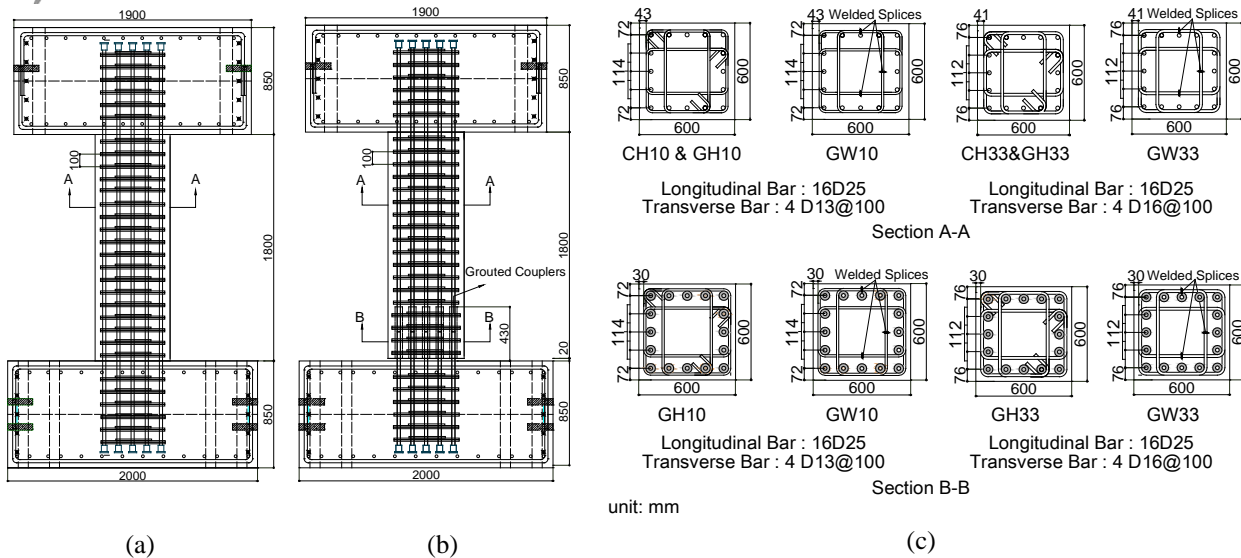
Cross Sectional Details (a) columns without grouted couplers (b) column with grouted couplers (c) section design
